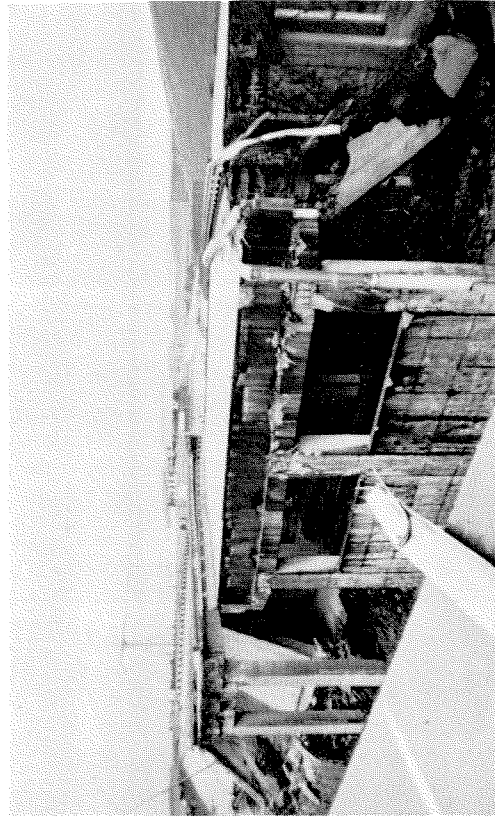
San Fernando Road overhead, Golden State-Foothill freeway interchange. The view shows the southwestern seat of the collapsed steel girder bridge section.
